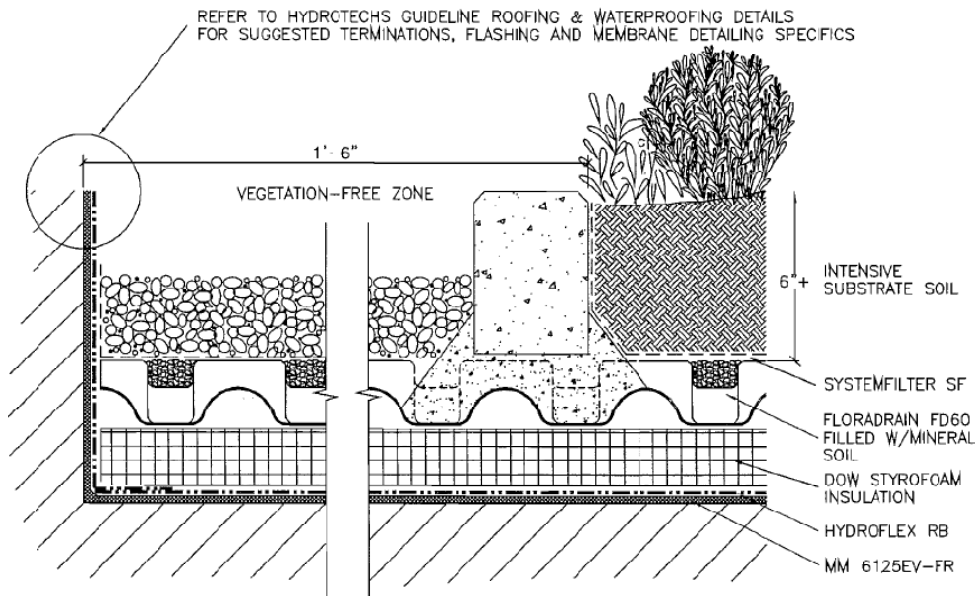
Typical Detail of Intensive Green Roof Termination Area
